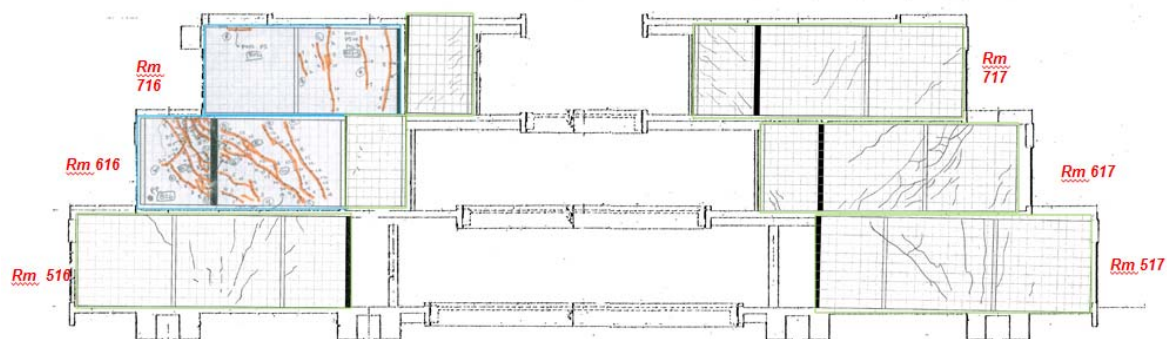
Crack map of typical wall line on ocean side (left) and mountainside (right) towers.
